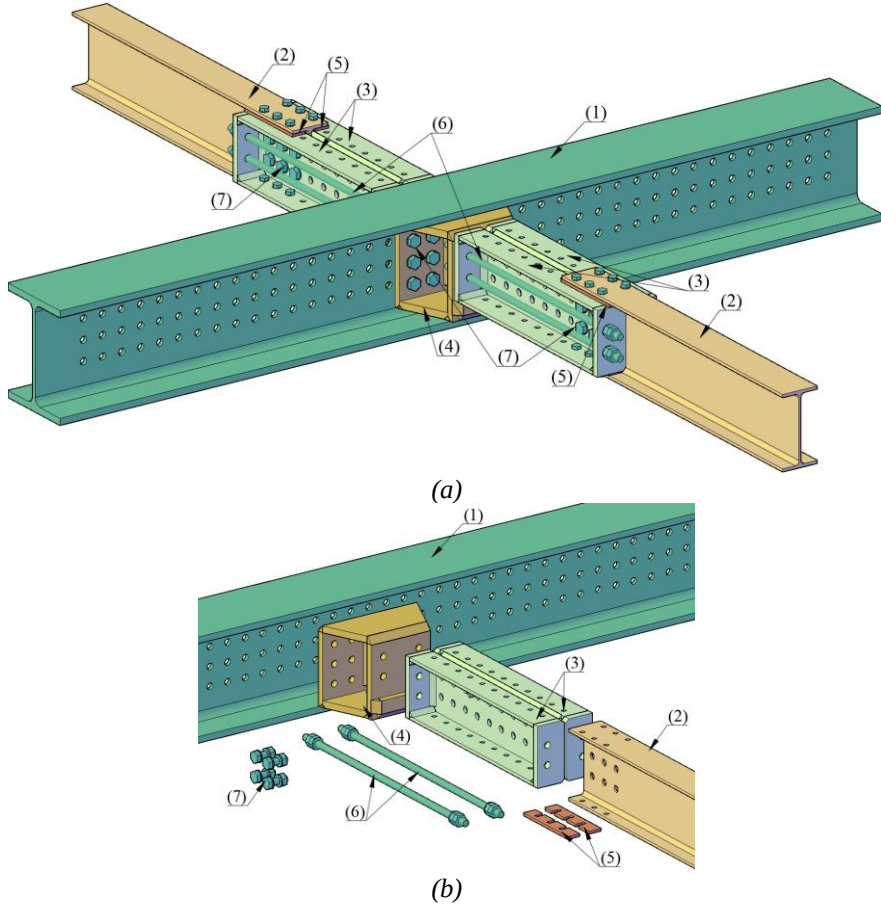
Two-sided beam-to-beam joint: (a) Assembled view; (b) Exploded view [6]
